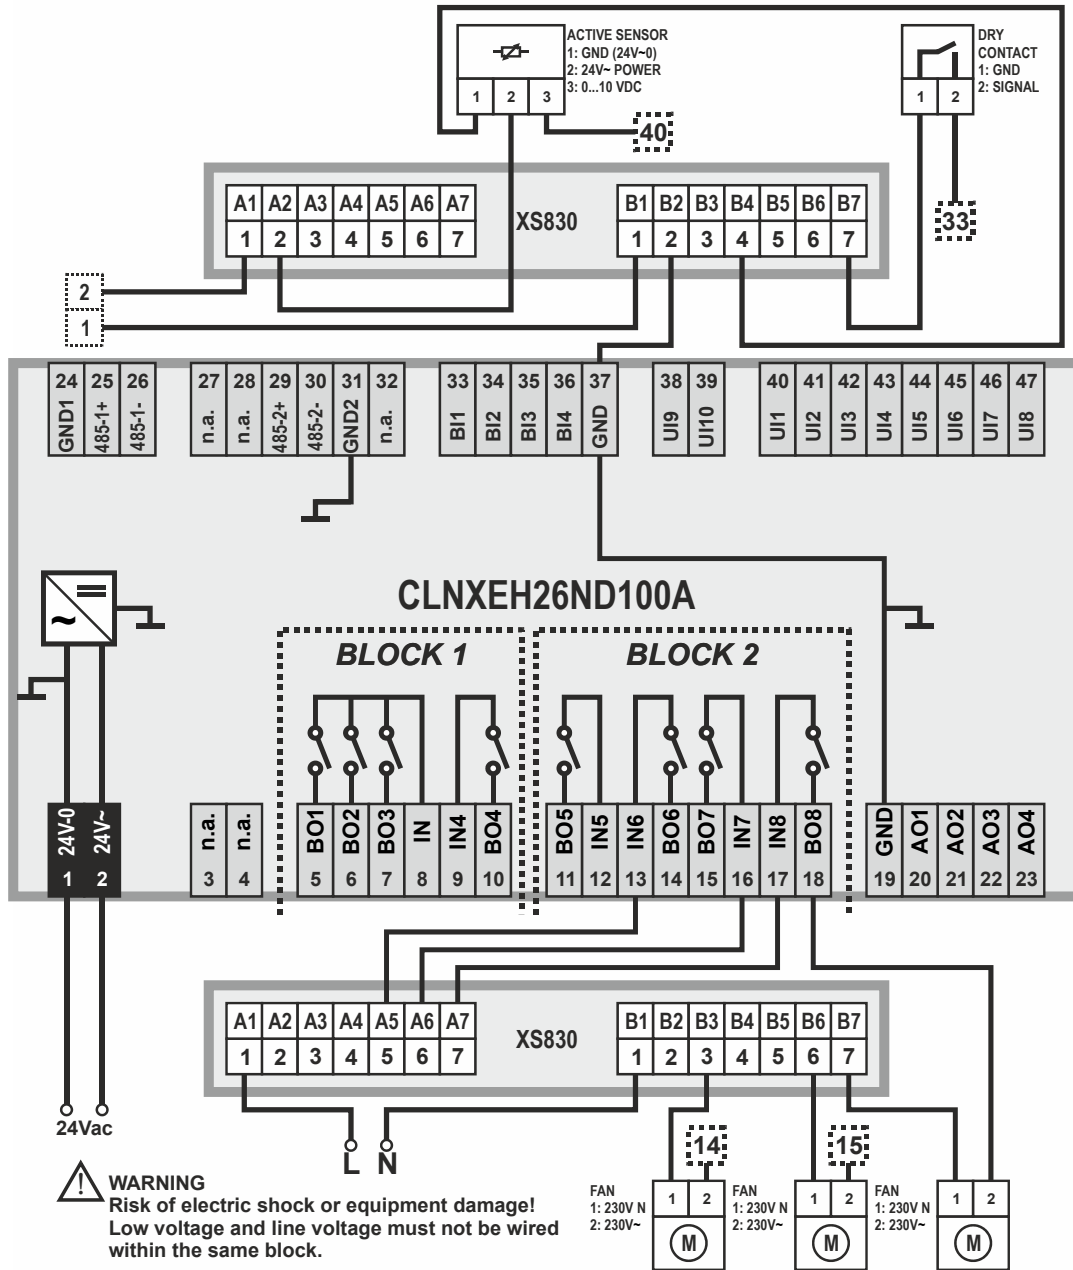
CLNXxxx26xxx connection example (with two XS830 Auxiliary Terminal Packages)
